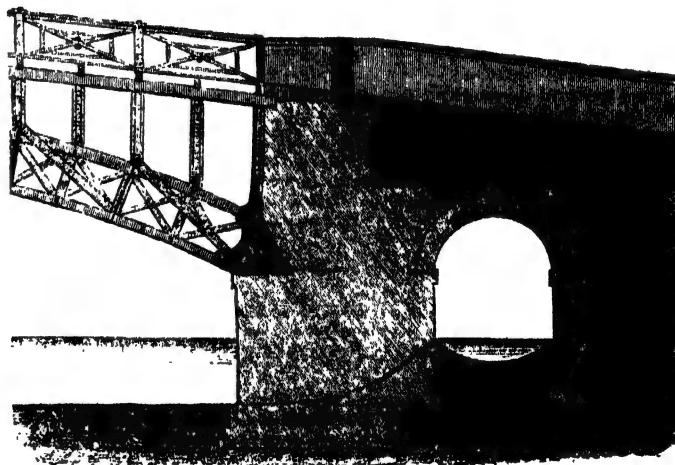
Plan of the Entrance to the Bridge and part of the Bridge.
